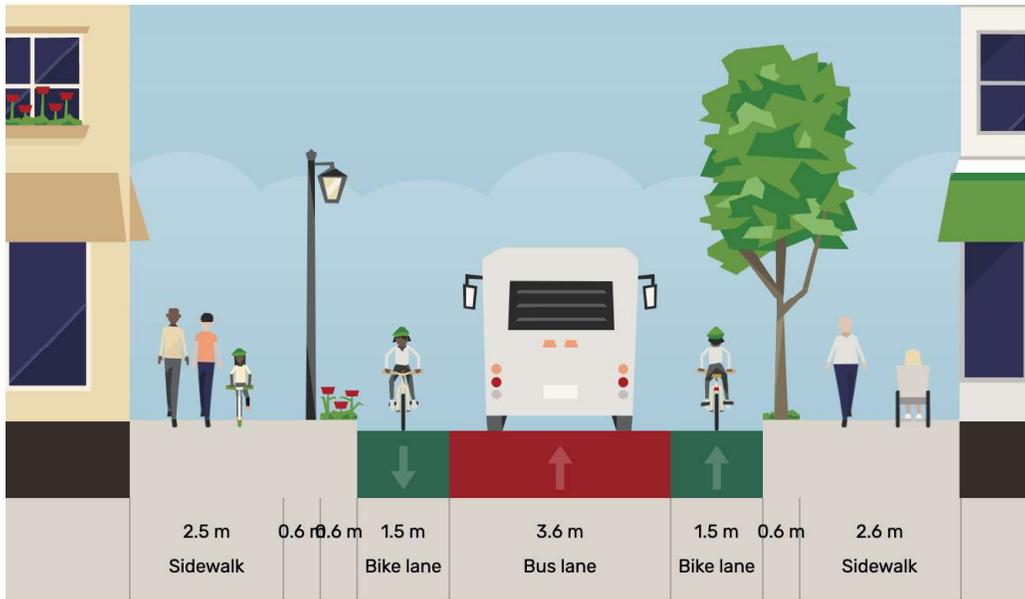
Typical cross section if N.S. Valderosa Avenue was transformed into a transit mall
